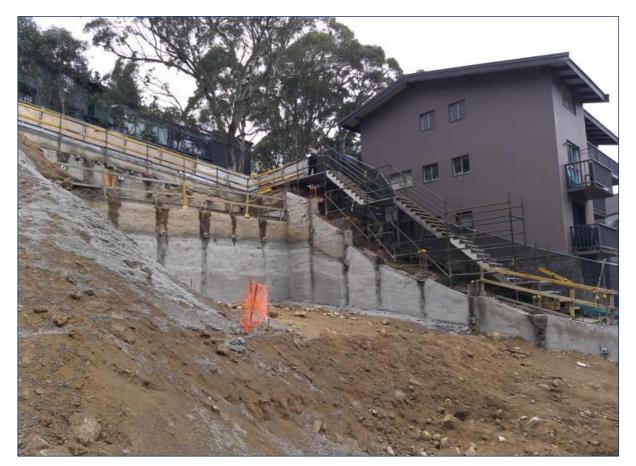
| Existing site excavation and installation of retention structures (Source: Department inspection)
